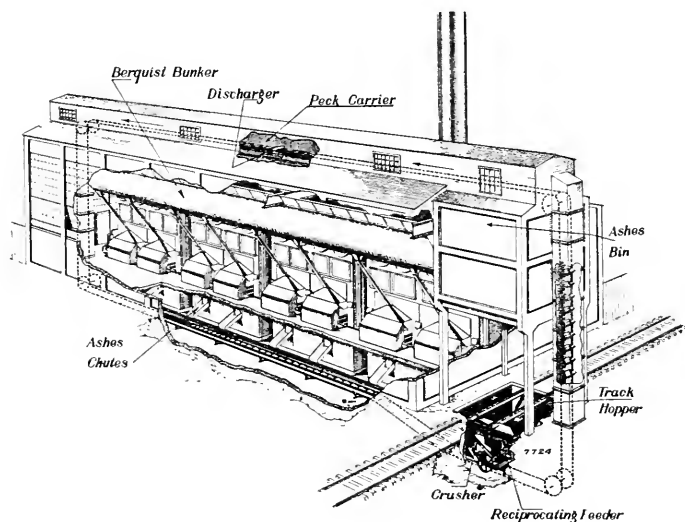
ILLUSTRATING BOILER HOUSE WITH BUCKET CONVEYOR FOR HANDLING BOTH COAL AND ASHES
